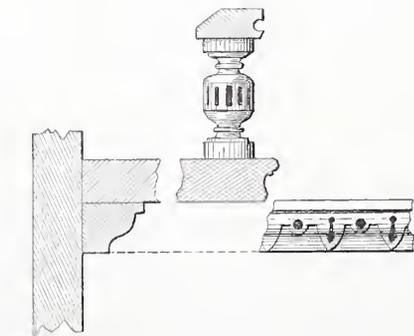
Detail of Lower Spindle Course.—Scale, 3 Inches to the Foot.
